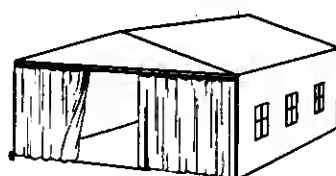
Steel, Glass and Brick Type Building (Austin) Adapted to either Factory or Hangar use
